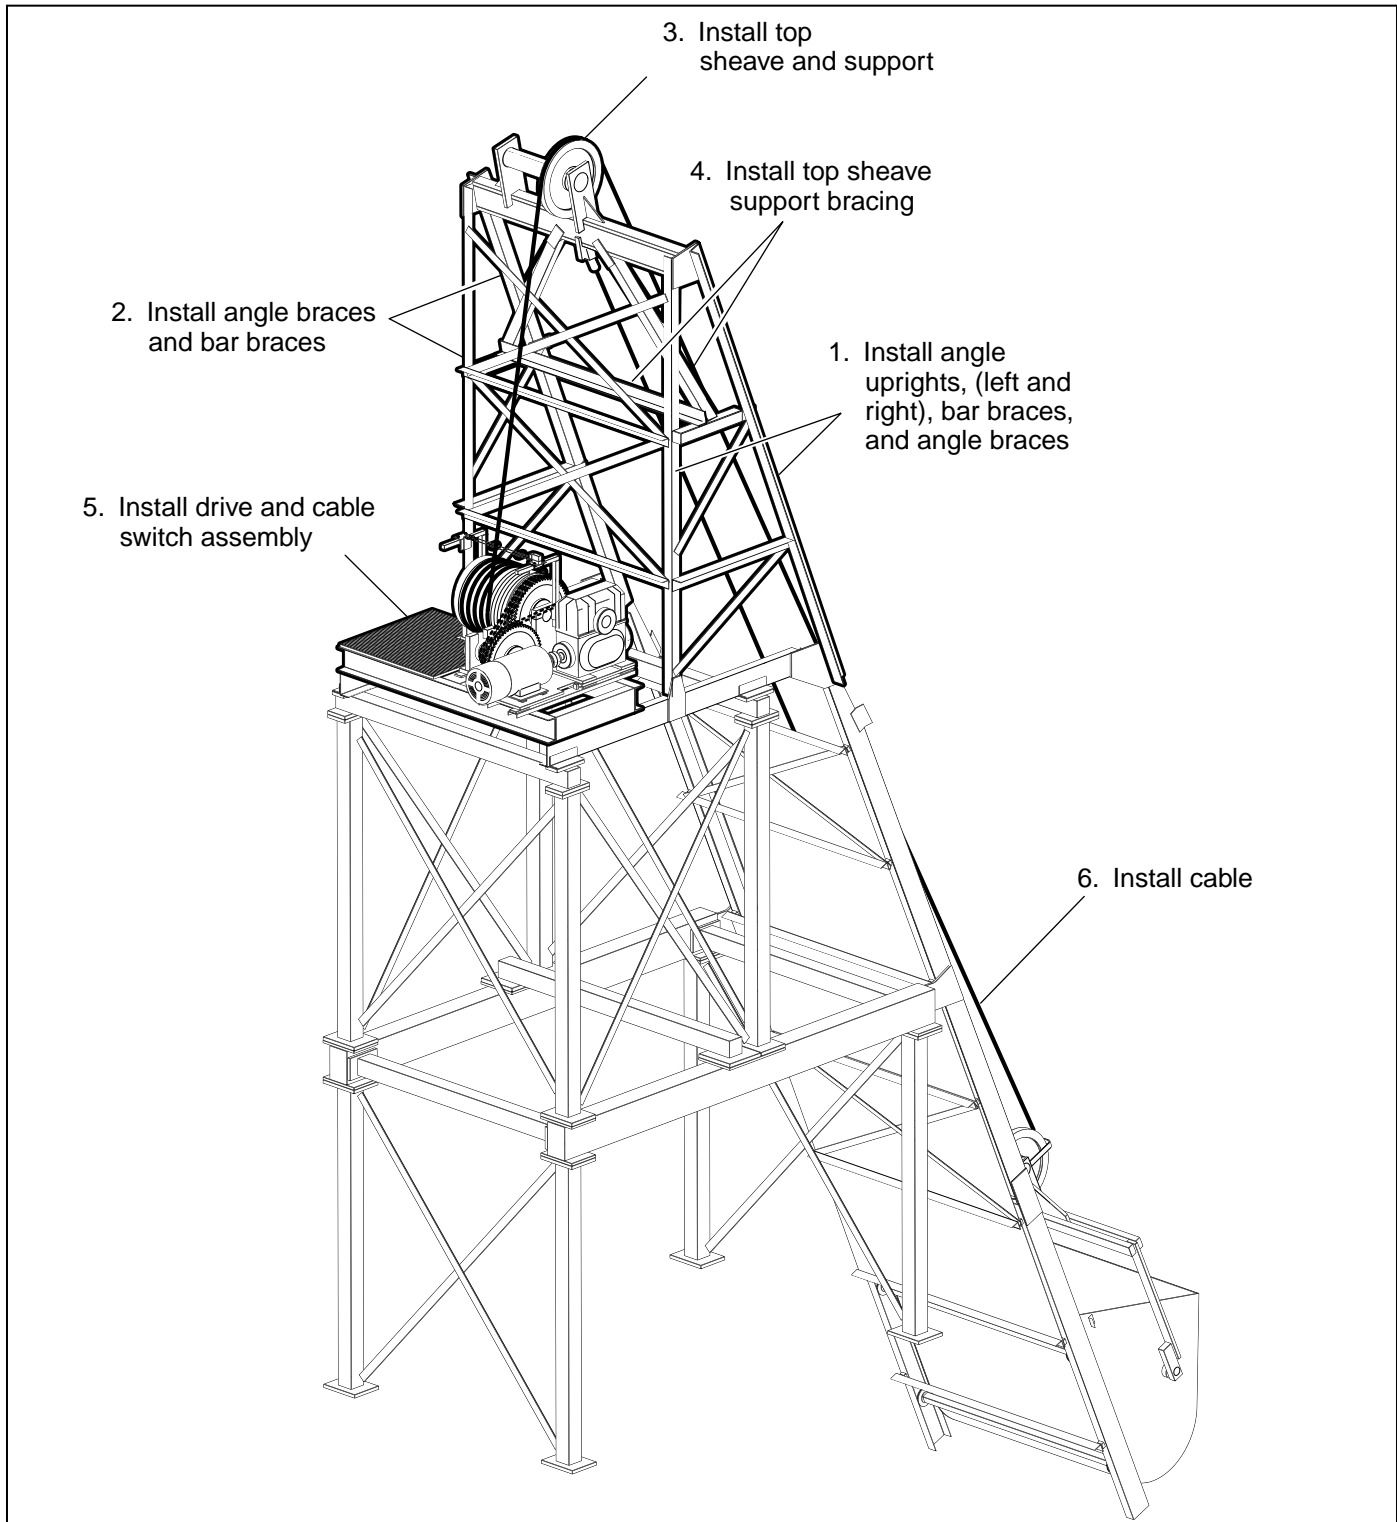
Tier C Supports, Braces, Drive and Cable
